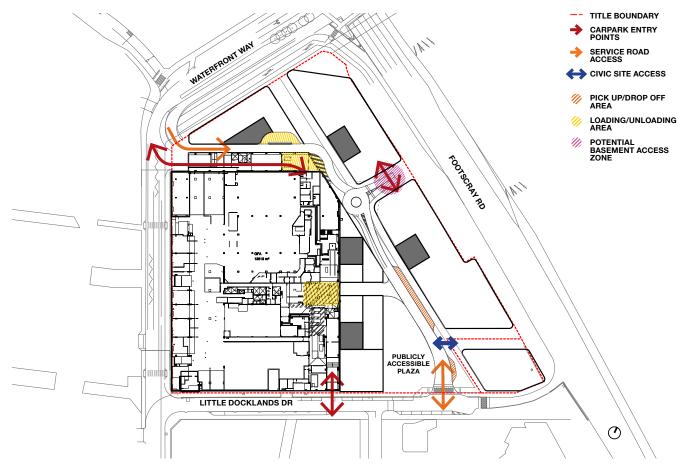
Movement and Parking Plan 4 - Access to car parking spaces, loading areas and pick up/drop off points
